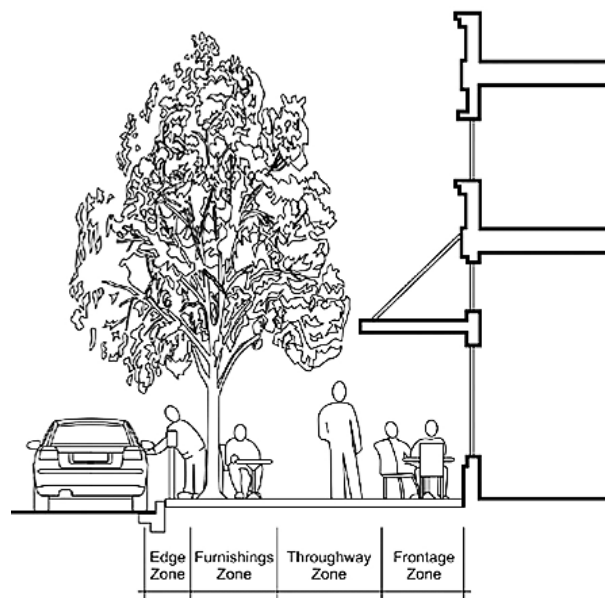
Pavement zones (Source: ITE, 2010: 116)
